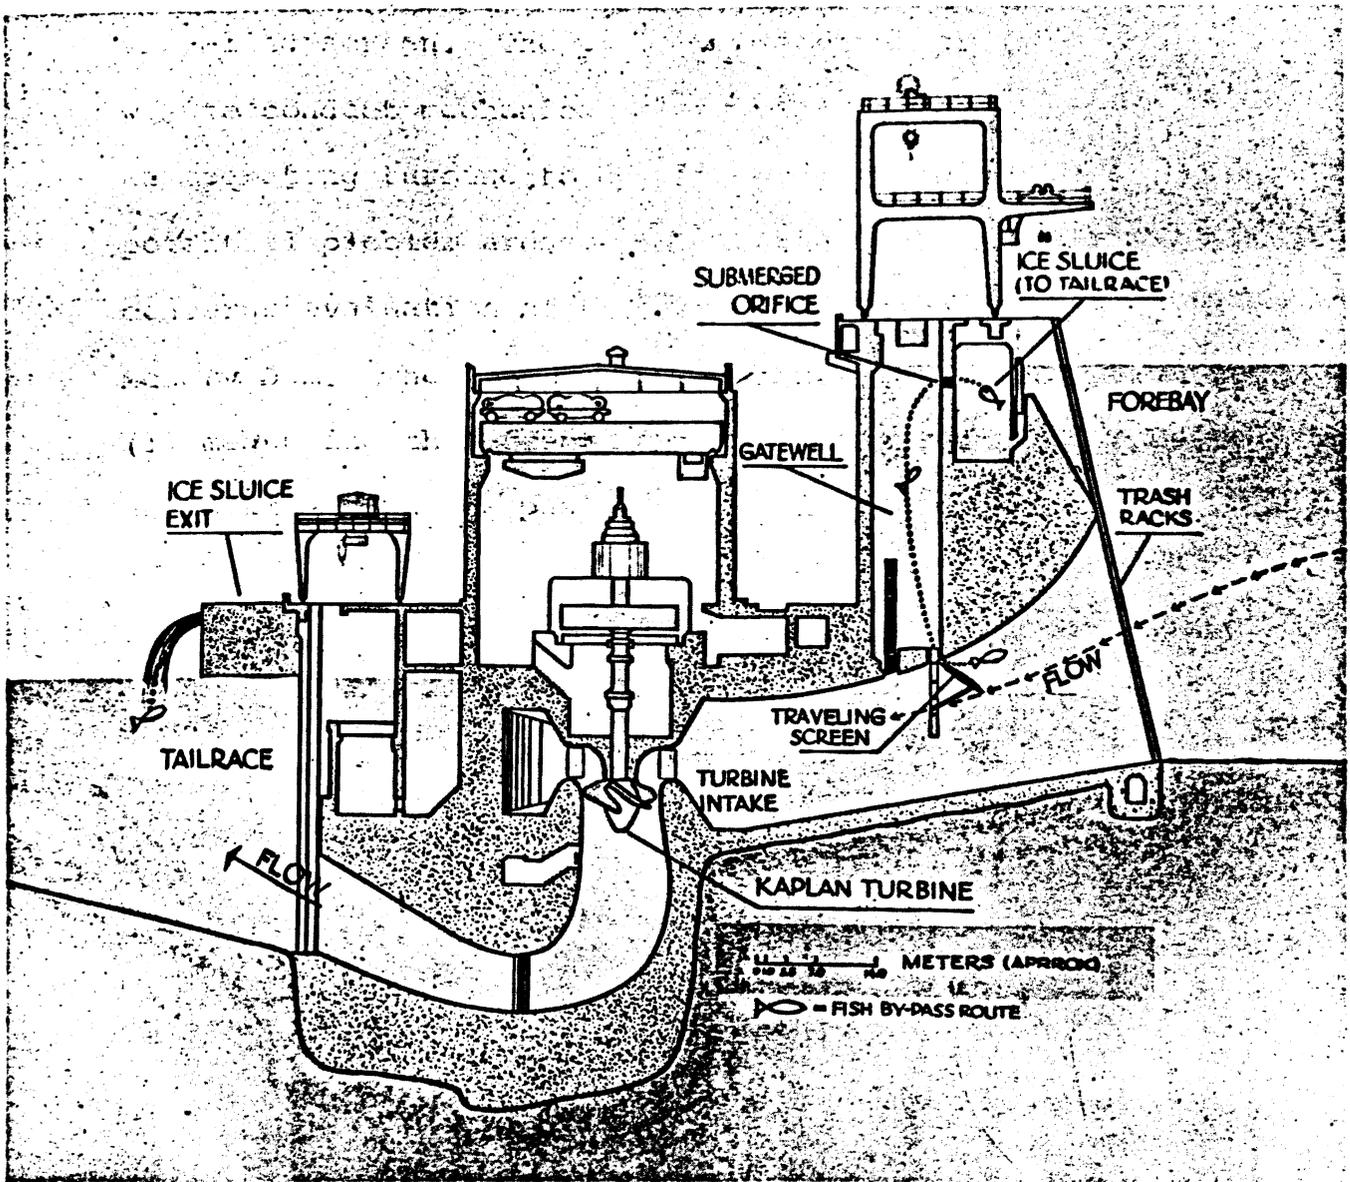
Section of a typical turbine showing fish bypass route around dam.
